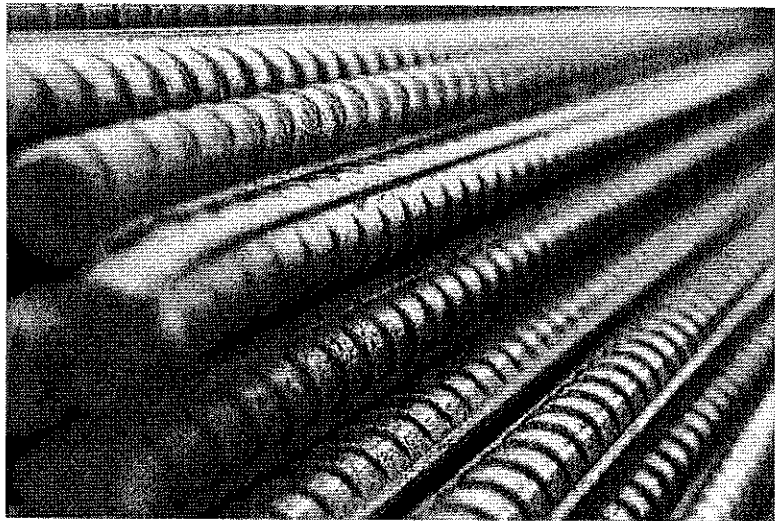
Deformed steel bars are known as rebar in home improvement stores.
